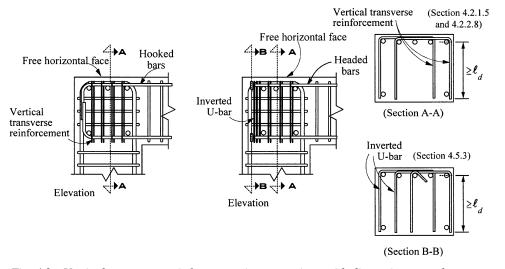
Vertical transverse reinforcement in connections with discontinuous columns.
